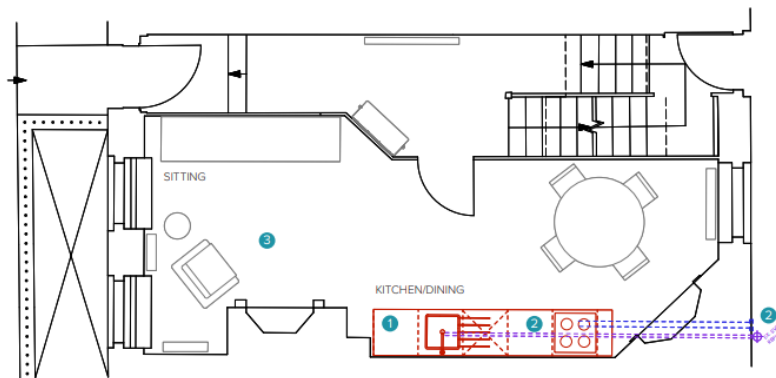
Proposed Ground Floor Plan (Archer and Braun Architecture)
